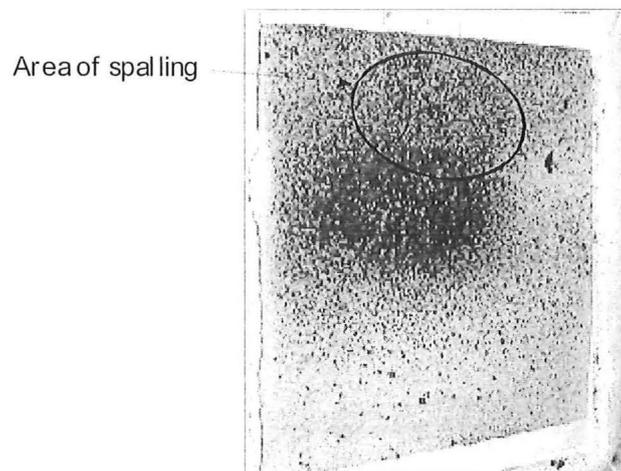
Spalling from exposed face of 175mm high strength slab
